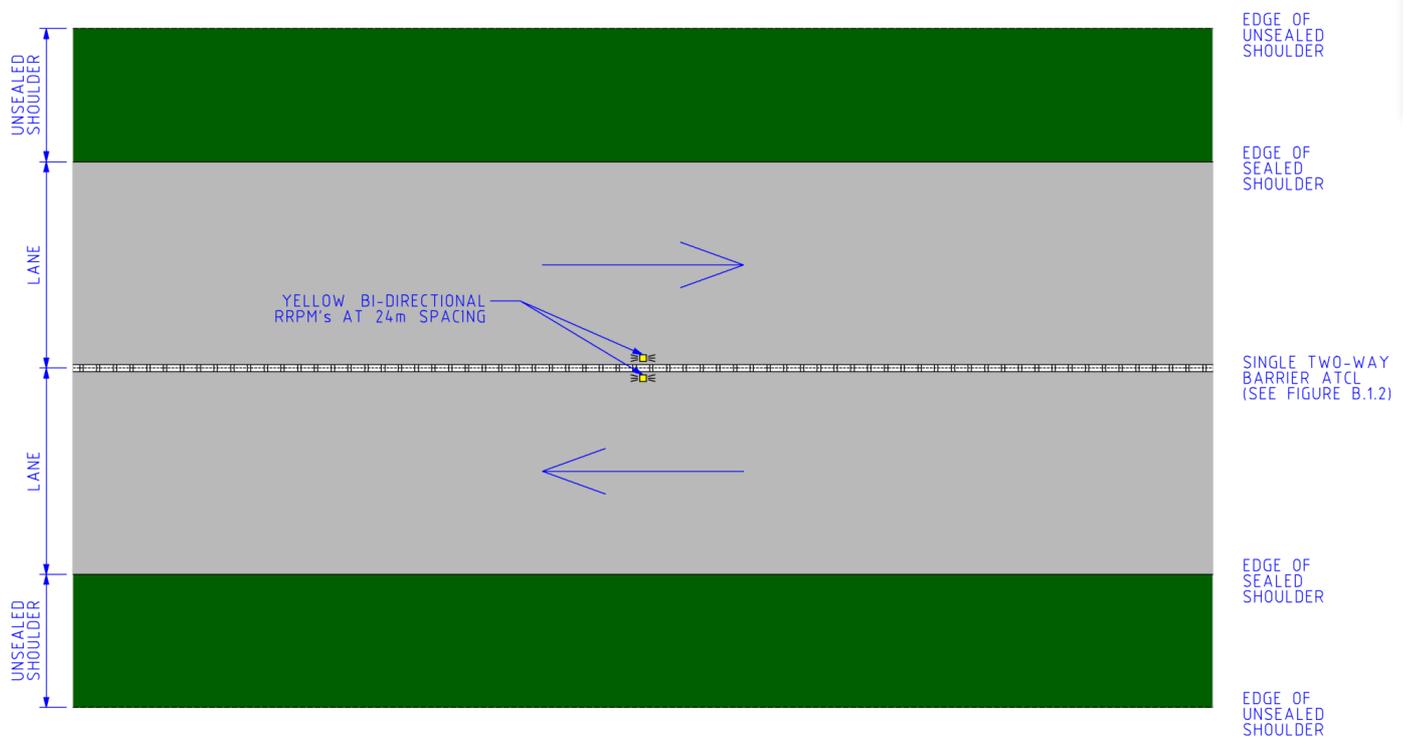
Plan Layout for Narrow Sealed Roads with Single Two-Way Barrier ATCL
